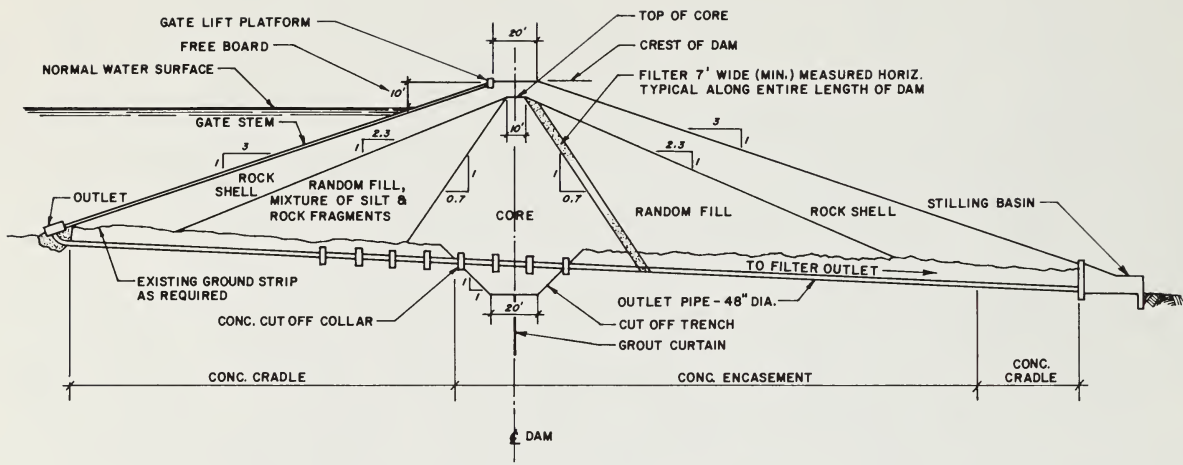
TYPICAL SECTION, EARTH AND ROCK FILL DAM
